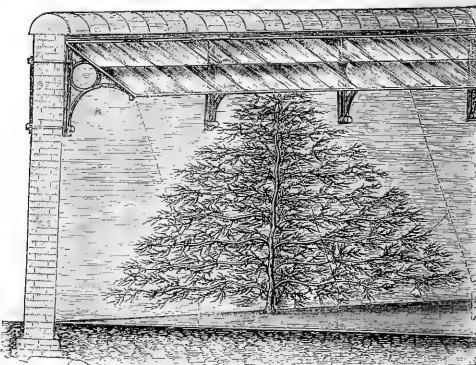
Glass and Iron Coping to Fruit Wall.
